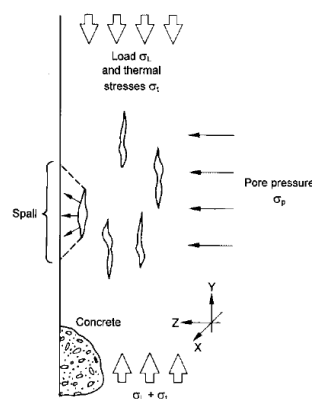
Forces acting in heated concrete inducing explosive spalling [32].
